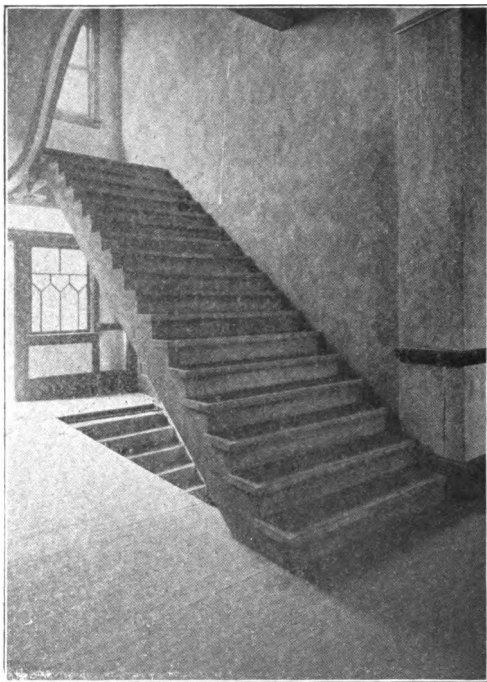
Staircase, Salvation Army Building, Cleveland, O.
